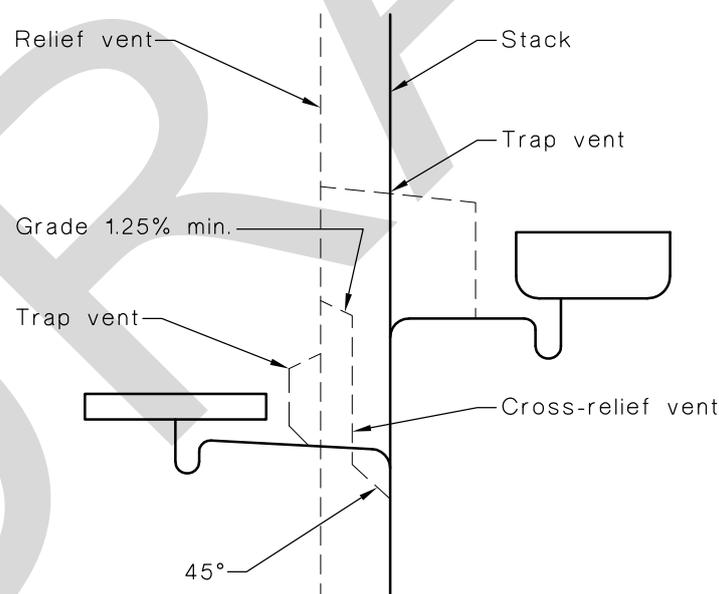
TYPICAL INSTALLATION OF CROSS-RELIEF VENT
